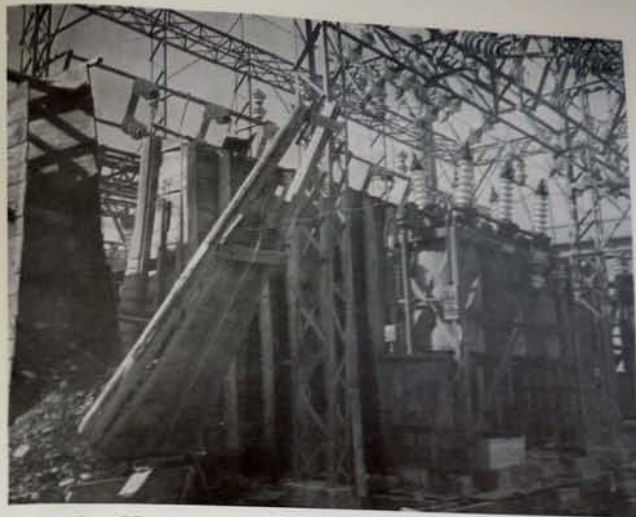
5,200 feet from GZ. High voltage circuit breaker and blast walls on east and south side of transformers, Urakami Substation.
